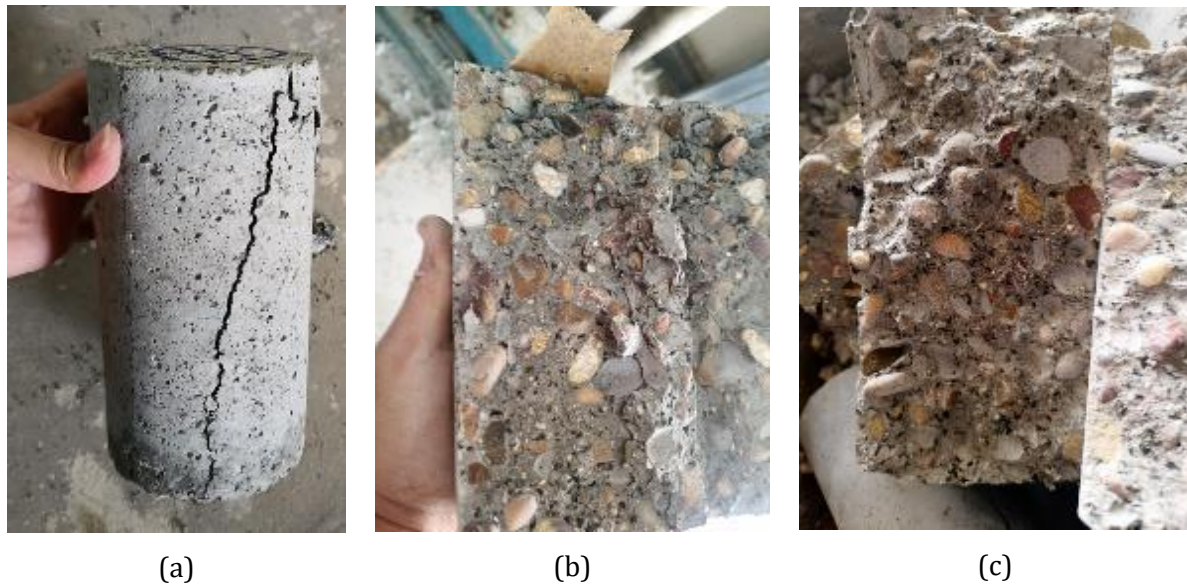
(a) Typical shape of cylinder failure. (b) Splitting face of Sr.10 sample. (c) failure face of SR.30 specimen
